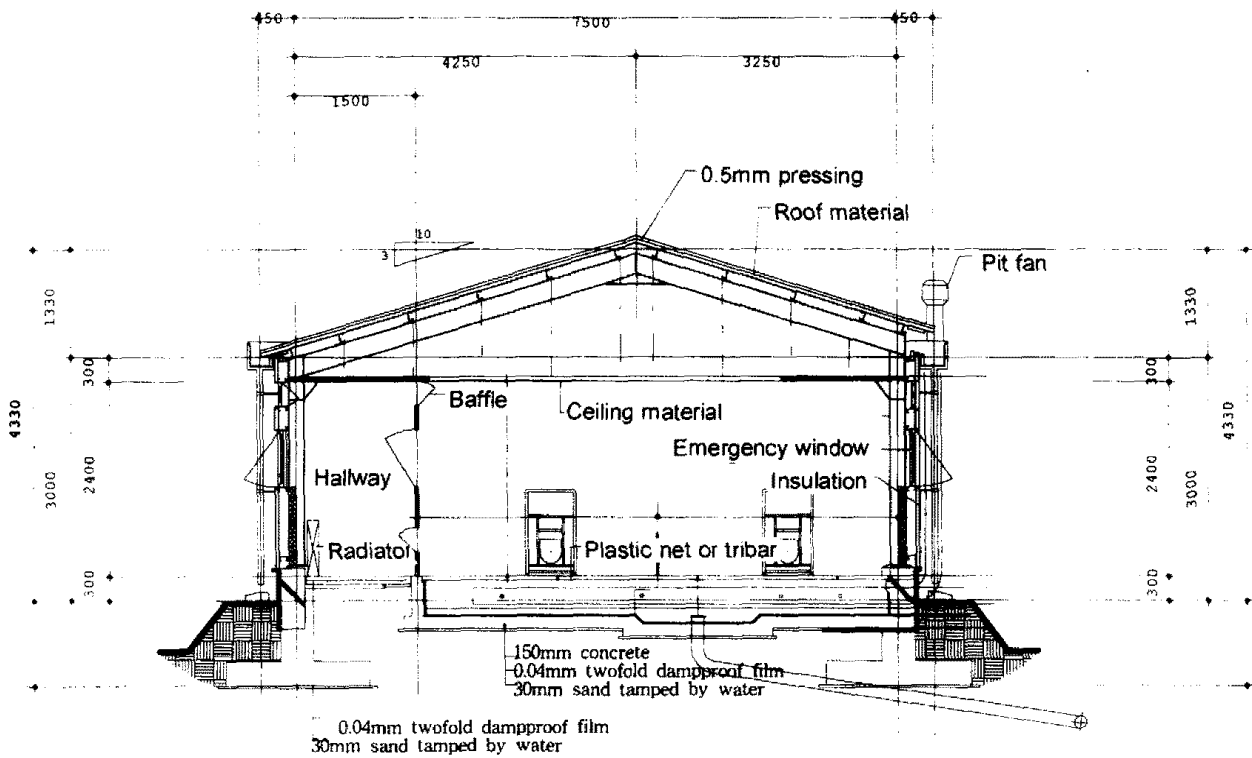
Cross-sectional view of a weaning building of MODEL- I
